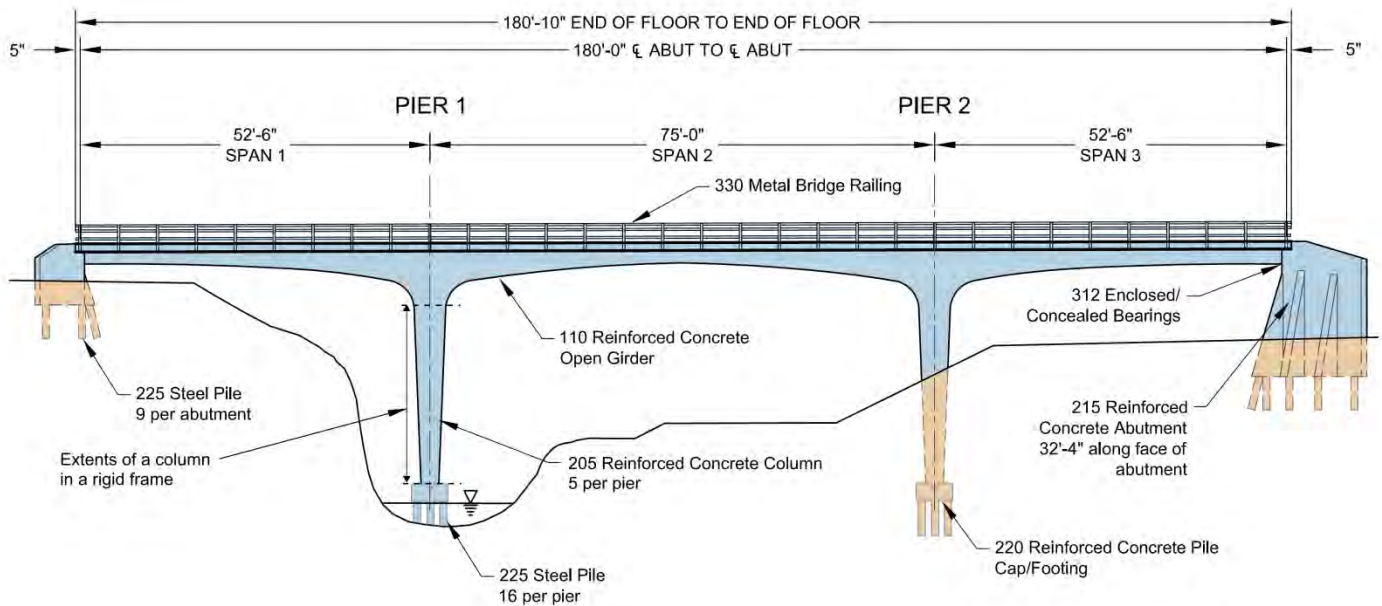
EI.24.4- 1: Elevation view of concrete rigid frame
